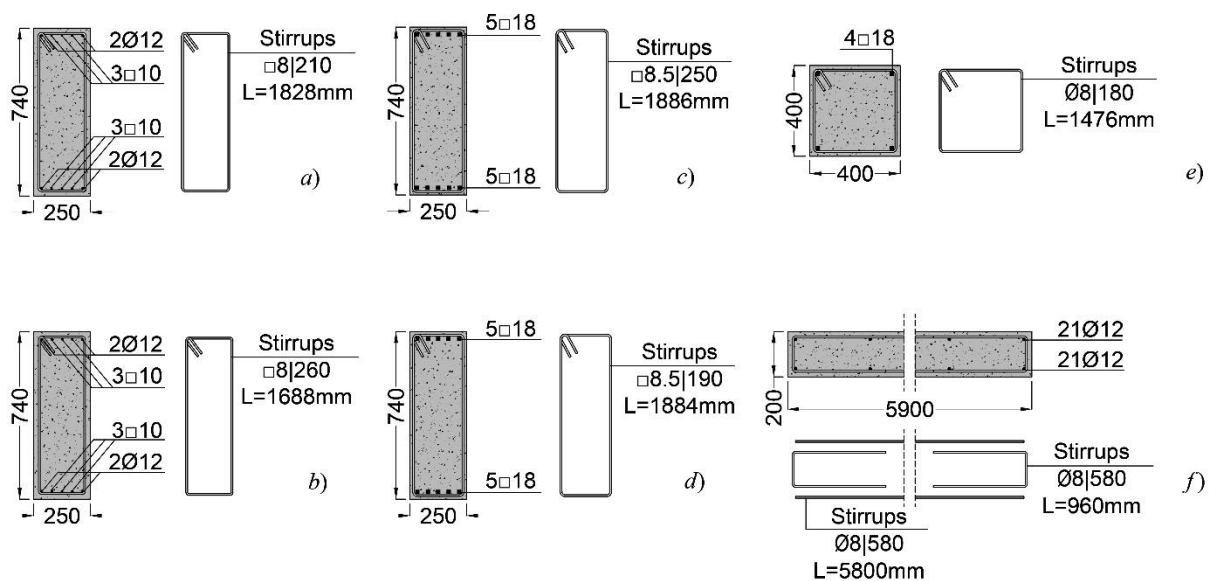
$T_{1,RC}$, (a-b) and $T_{2,RC}$ (c-d) beam sections at half-span (a-c) and at the ends (b-d); P_{RC} column section (e); $S_{I,RC}$ wall section (f)
